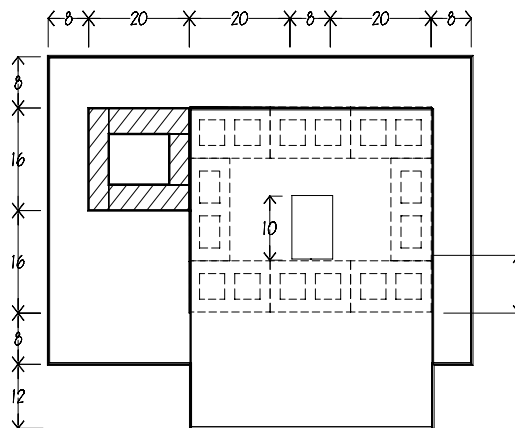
Typical foundation, plan view. Concrete block laid out for minimal cuts. Hollow foundation is used to store ashes. Cantilevered concrete slab provides noncombustible heart extension.
